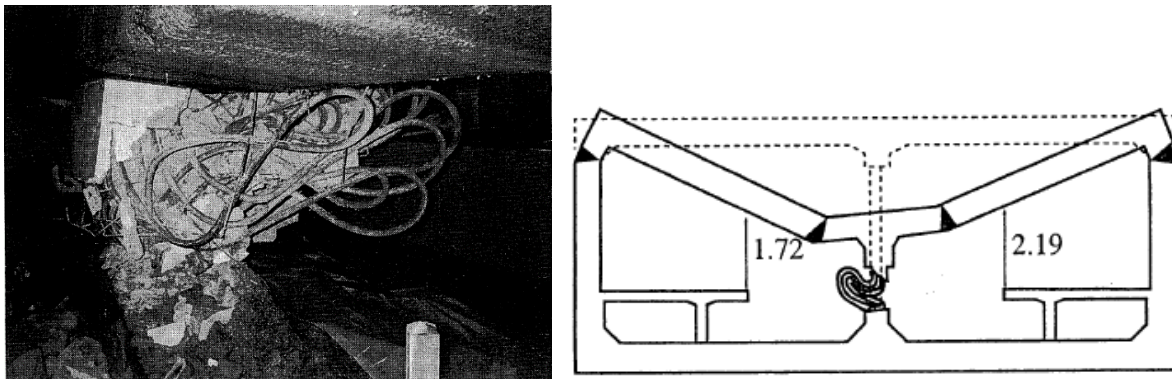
Damage to the center column No. 10 (Iida et al., 1996)
